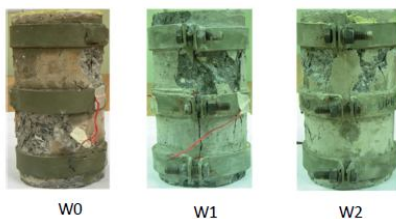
Crack pattern of concrete cylinder S-10/20.
